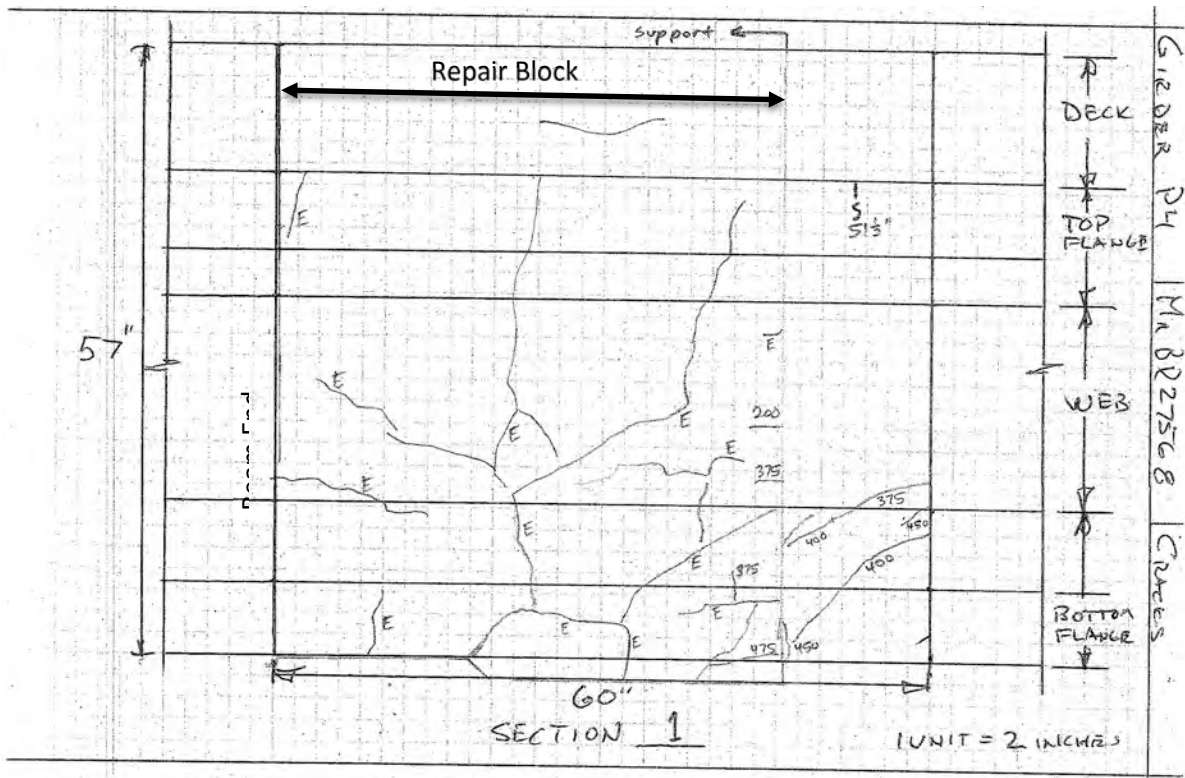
Girder P4 Crack Pattern – Section 1 (See Figure 3.4 for Section limits)
